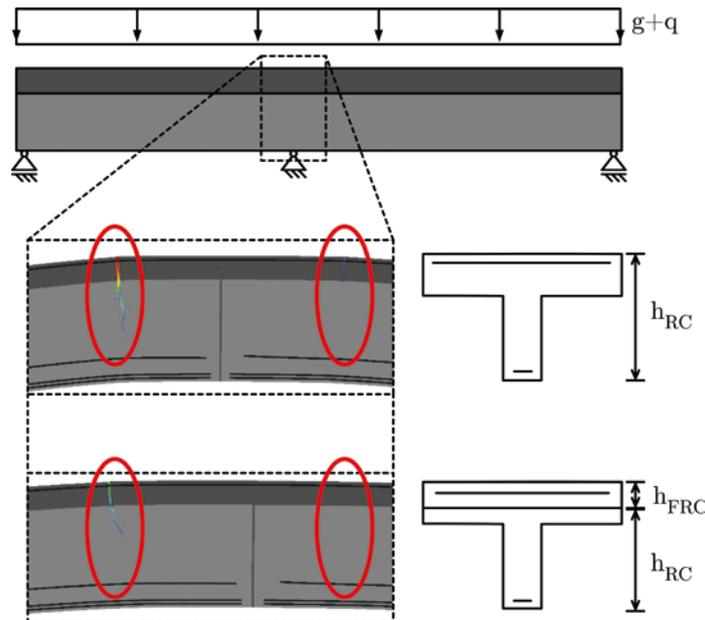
Comparison of the crack width between a classical reinforced concrete (RC) cross-section (upper cross-section) and a reinforced concrete cross-section strengthened by a fibre-reinforced concrete (FRC) layer (lower cross-section) under external load q – Figure kindly provided by sub-project SP 6
